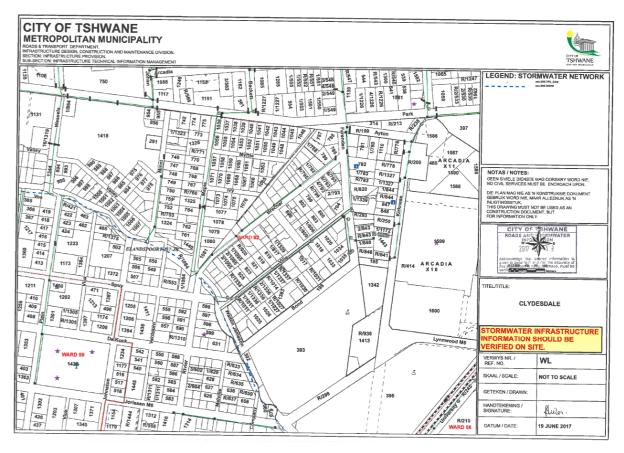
Stormwater infrastructure. Pipes are marked in green.
